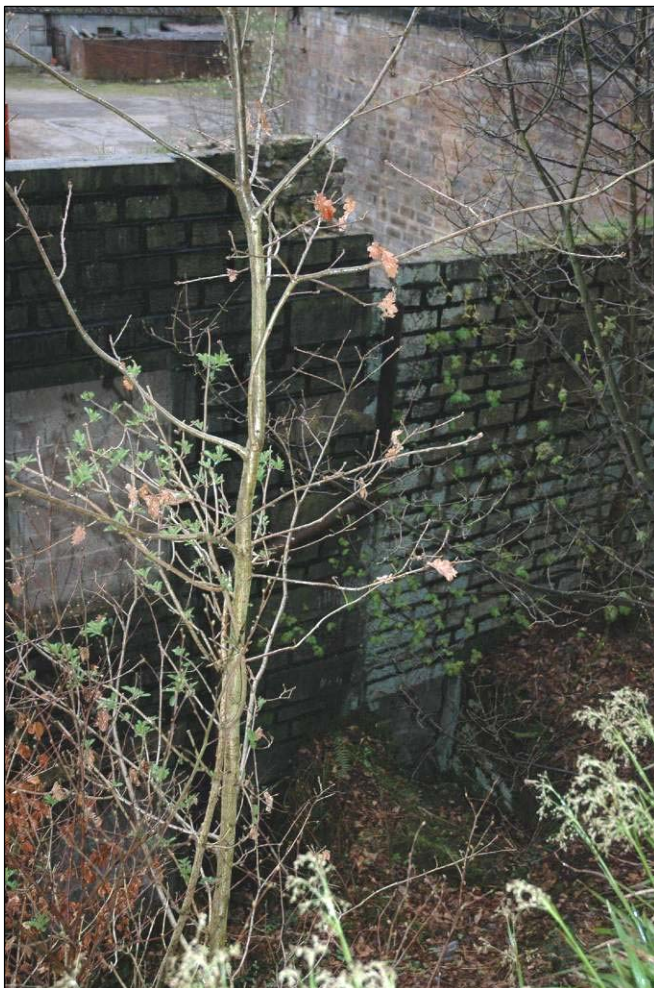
North facing elevation of building 5 and retaining wall to west (2005)
